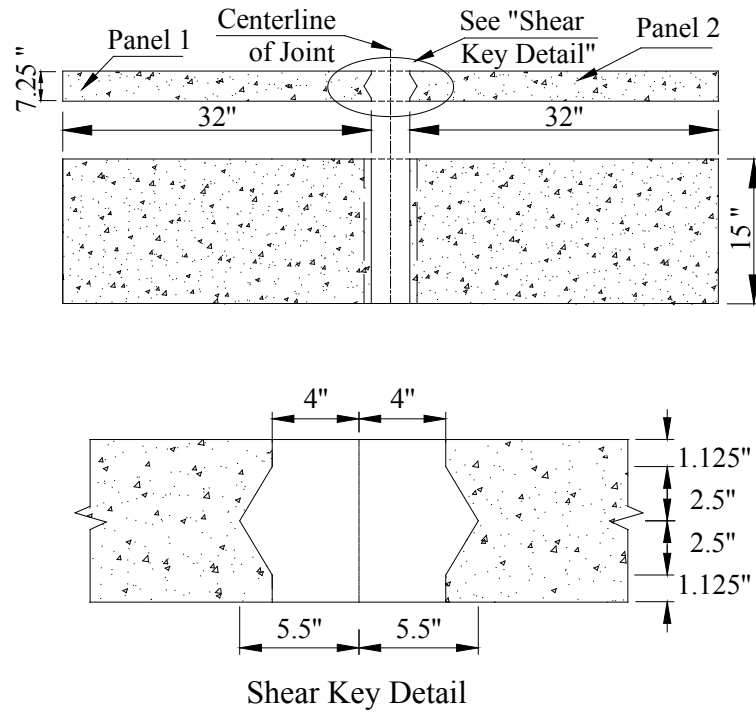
Dimension of transverse joint (tension) specimen
